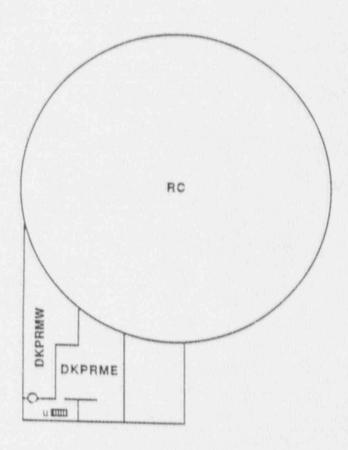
Rancho Seco Containment and Auxiliary Buildings, Elevation -47 ft.
